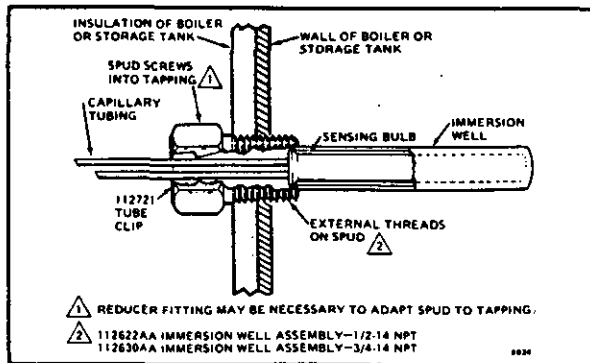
MOUNTING THE SENSING BULB IN AN IMMERSION WELL.
